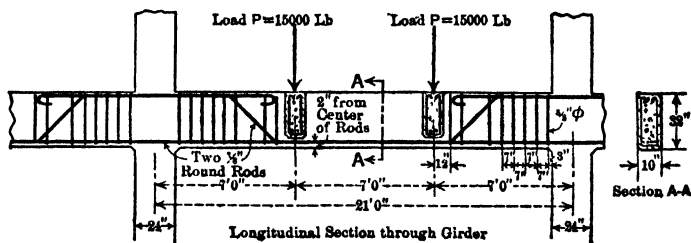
Typical Design of a Fully Continuous Rectangular Girder Carrying Concentrated Loads
